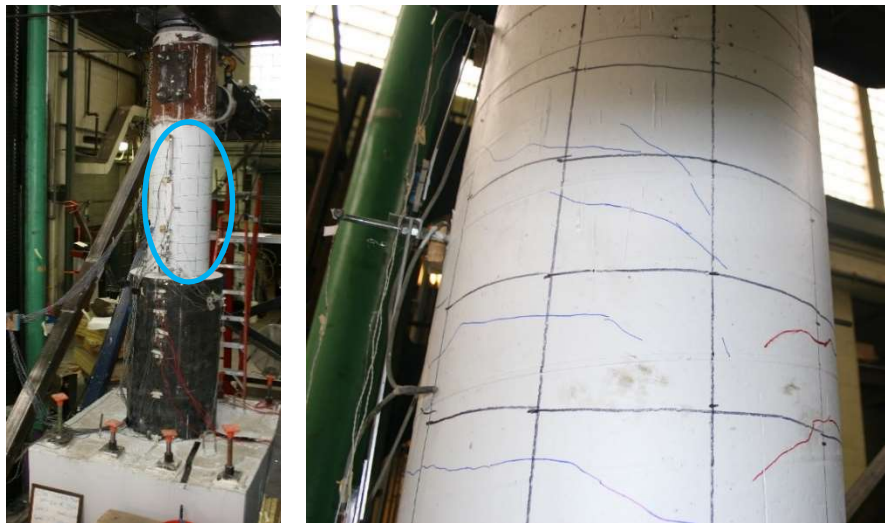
Specimen 30-21-R Horizontal Cracks at 1.1% Drift
